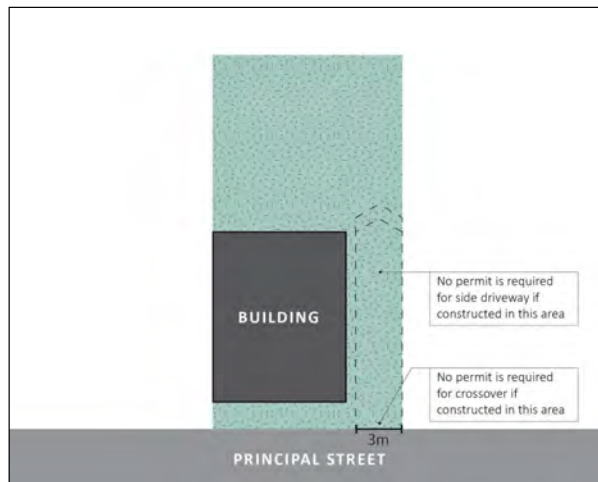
Construction of a new crossover and driveway is permit exempt if constructed in this location.
